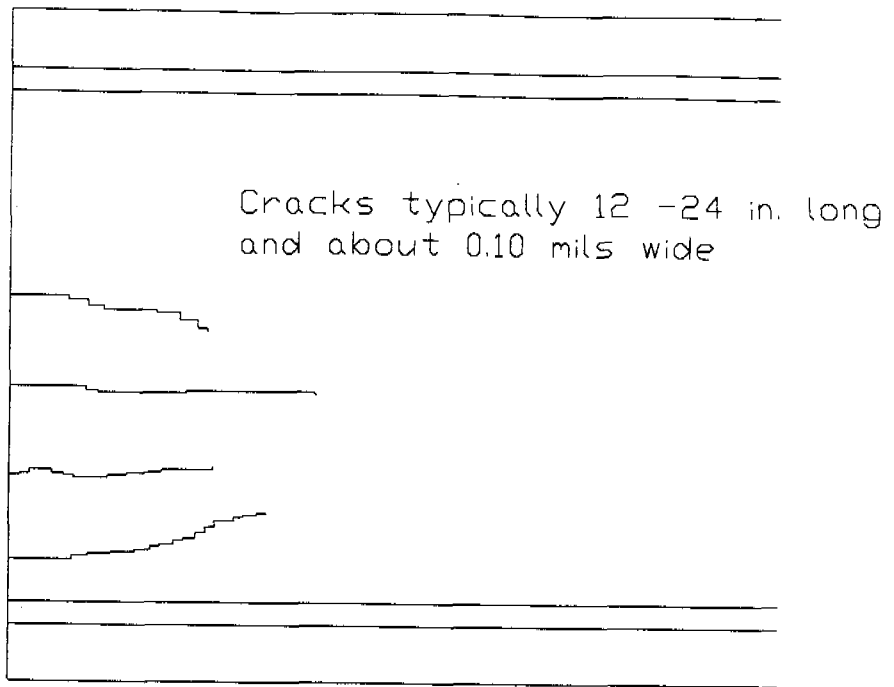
Web Cracks in 81 in. Girders
